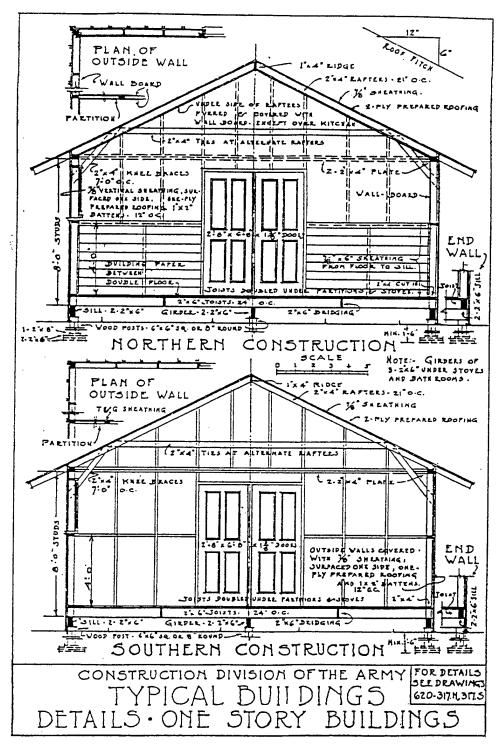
Typical building details for standardized buildings to be built in either northern or southern areas. (Construction Division, Manual of the Construction Division of the Army, Section C, Engineering Division [Washington: Consolidated Supply Co. Printers, 1919, plate 46])
